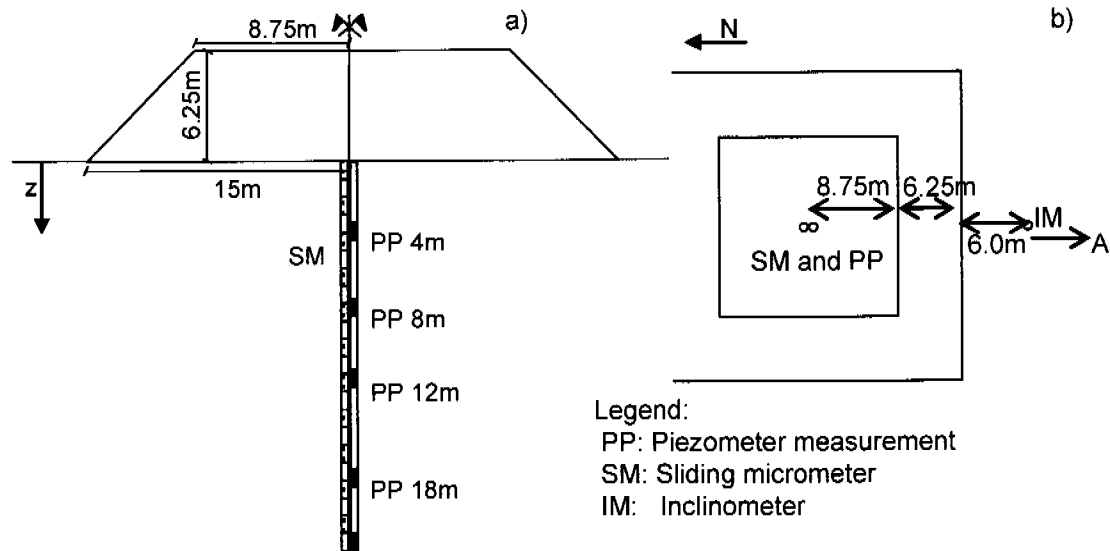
Sketch of the Birmensdorf test fill: a) section, b) plan.
